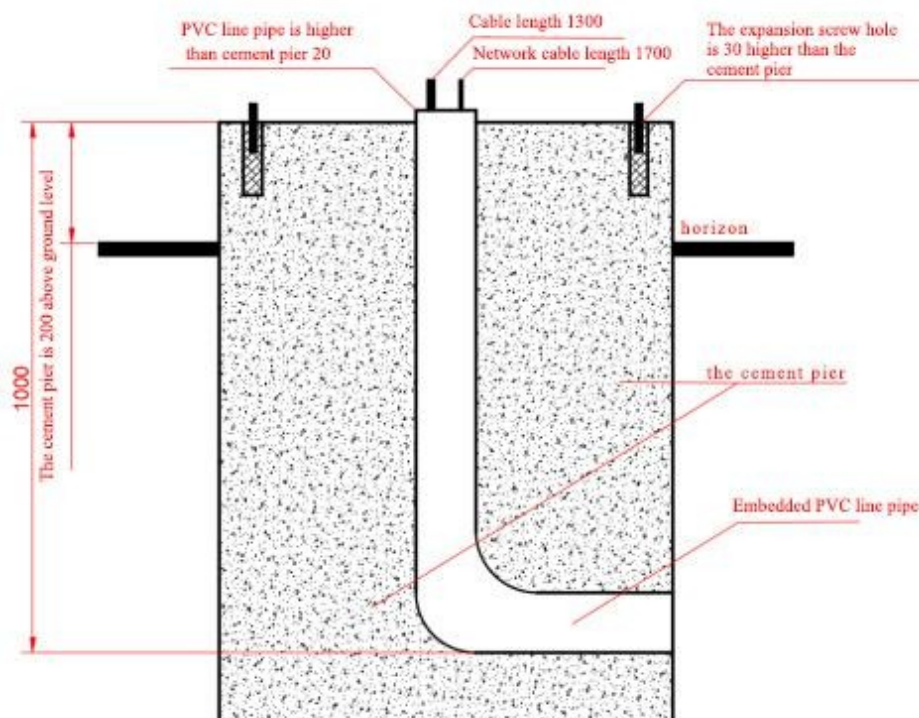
Schematic diagram size recommendation of foundation 300*300*200
